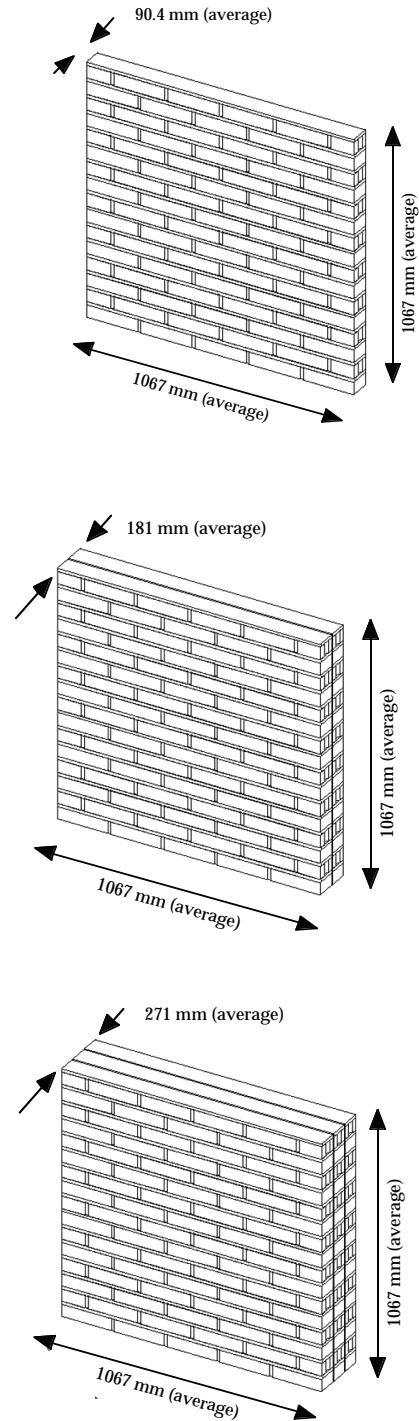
Brick wall geometries. Top: single wythe; Middle: double wythe; and Bottom: triple wythe construction. An air gap of between 3 to 5 mm existed between each wall in the multiple-wall tests owing to variations in placement of the bricks. Typical mortar joint thicknesses are presented in Table 3.1.1.
